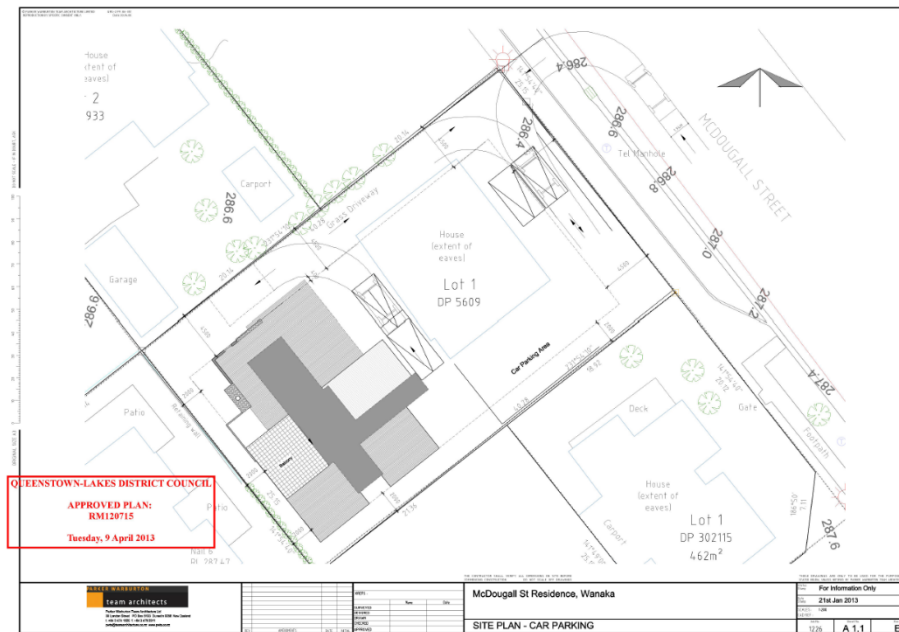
Approved Site Parking Plan (Under an Earlier Resource Consent)
